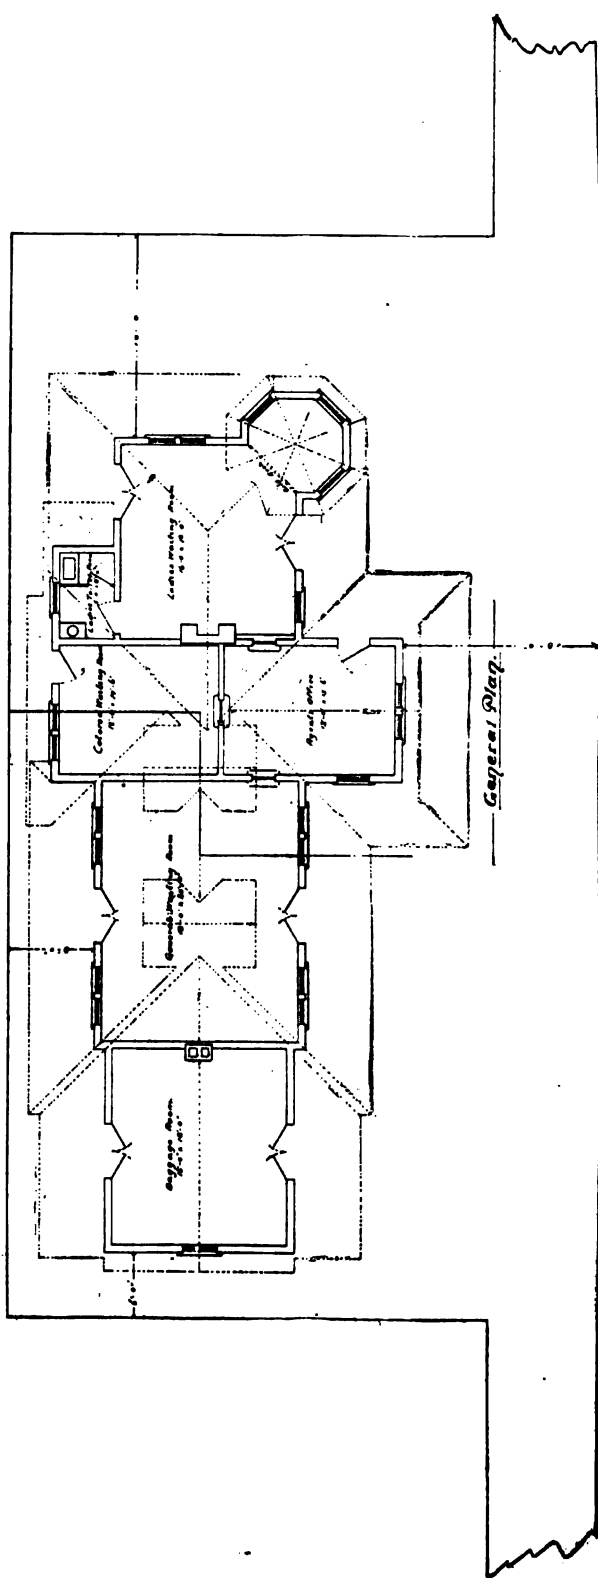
FLOOR PLAN OF LOCAL PASSENGER DEPOT AT RICHMOND, KY., LOUISVILLE AND NASHVILLE R. R. (PLANS NOS. 18 AND 19.)
